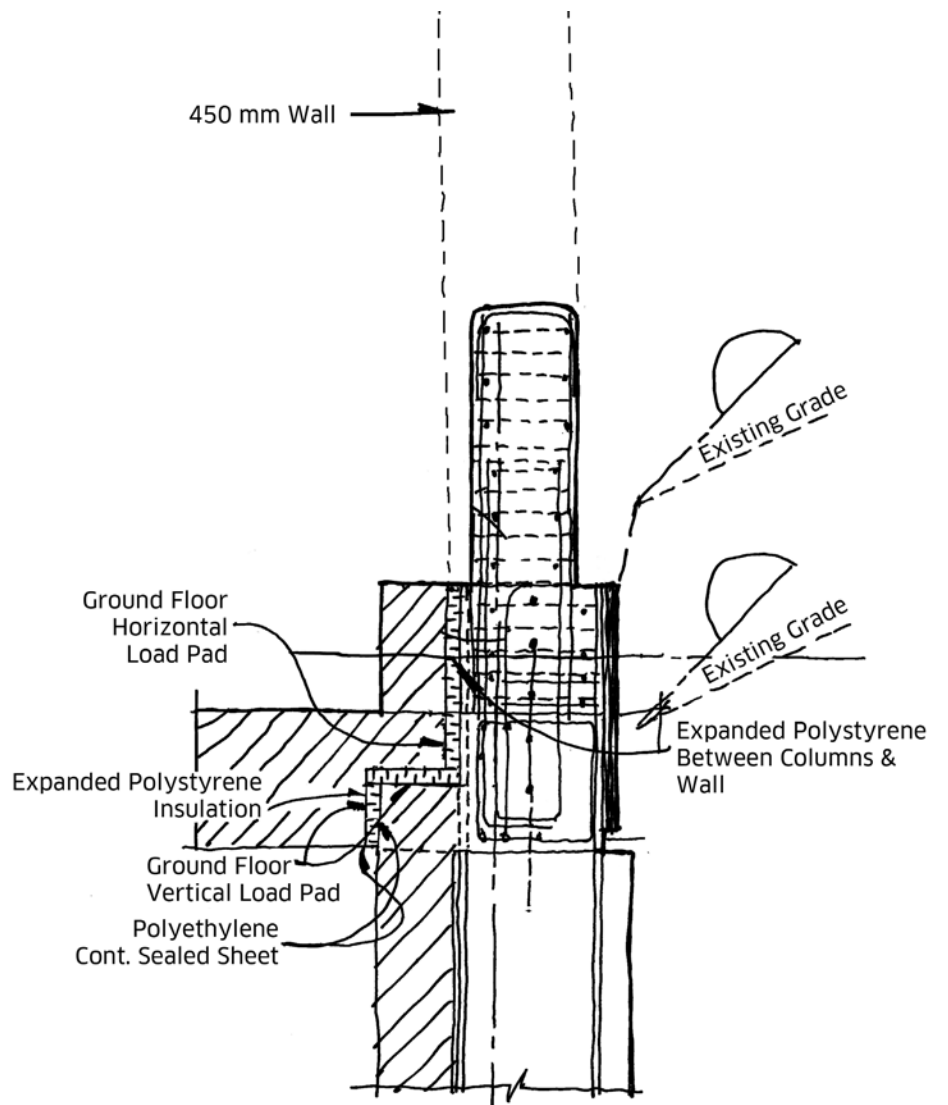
B // DEEP VIBRATION ISOLATION DETAIL, COMBINED WITH CRASH WALL.
